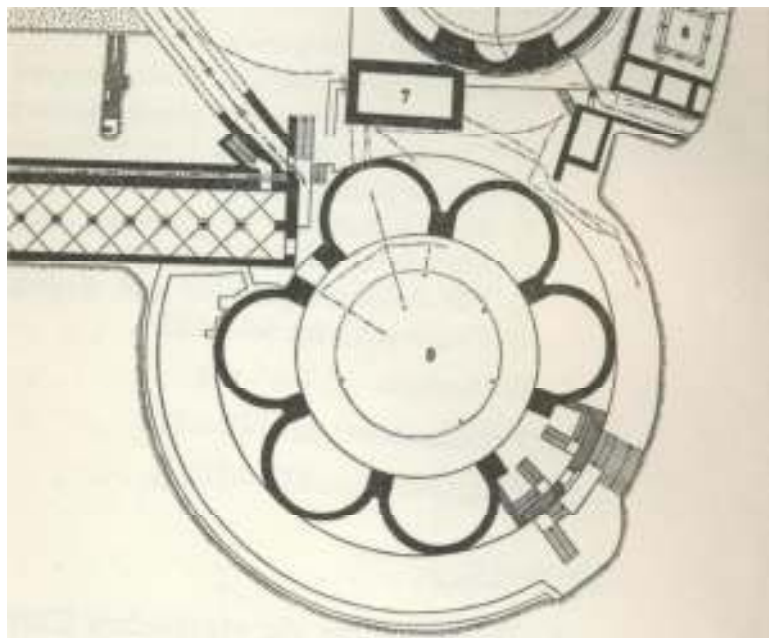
Plan of the so-called Lower Round Building from the Pergamene Asklepieion., no. 9.
